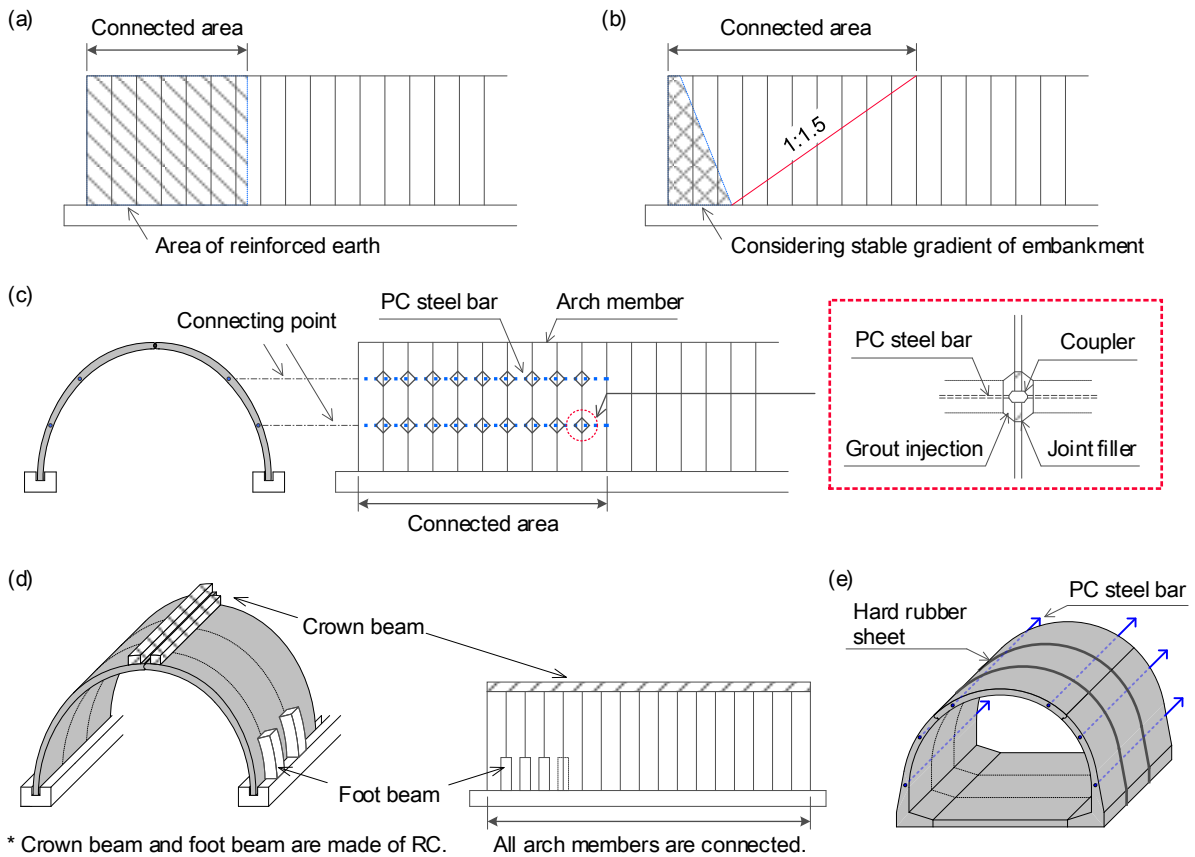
The longitudinal connection of the arch members depends on the type of hinged arch culvert. In the old type of three-hinged arch culvert, the arch members are (a) connected with the construction of a reinforced earth wall or (b) connected without the construction of a reinforced earth wall, and (c) connected longitudinally by PC steel bars. In (d), the longitudinal connection in the current type of three-hinged arch culvert, after the revision of the design manual in 2014, is seen. In (e), the two-hinged arch culvert is seen.
